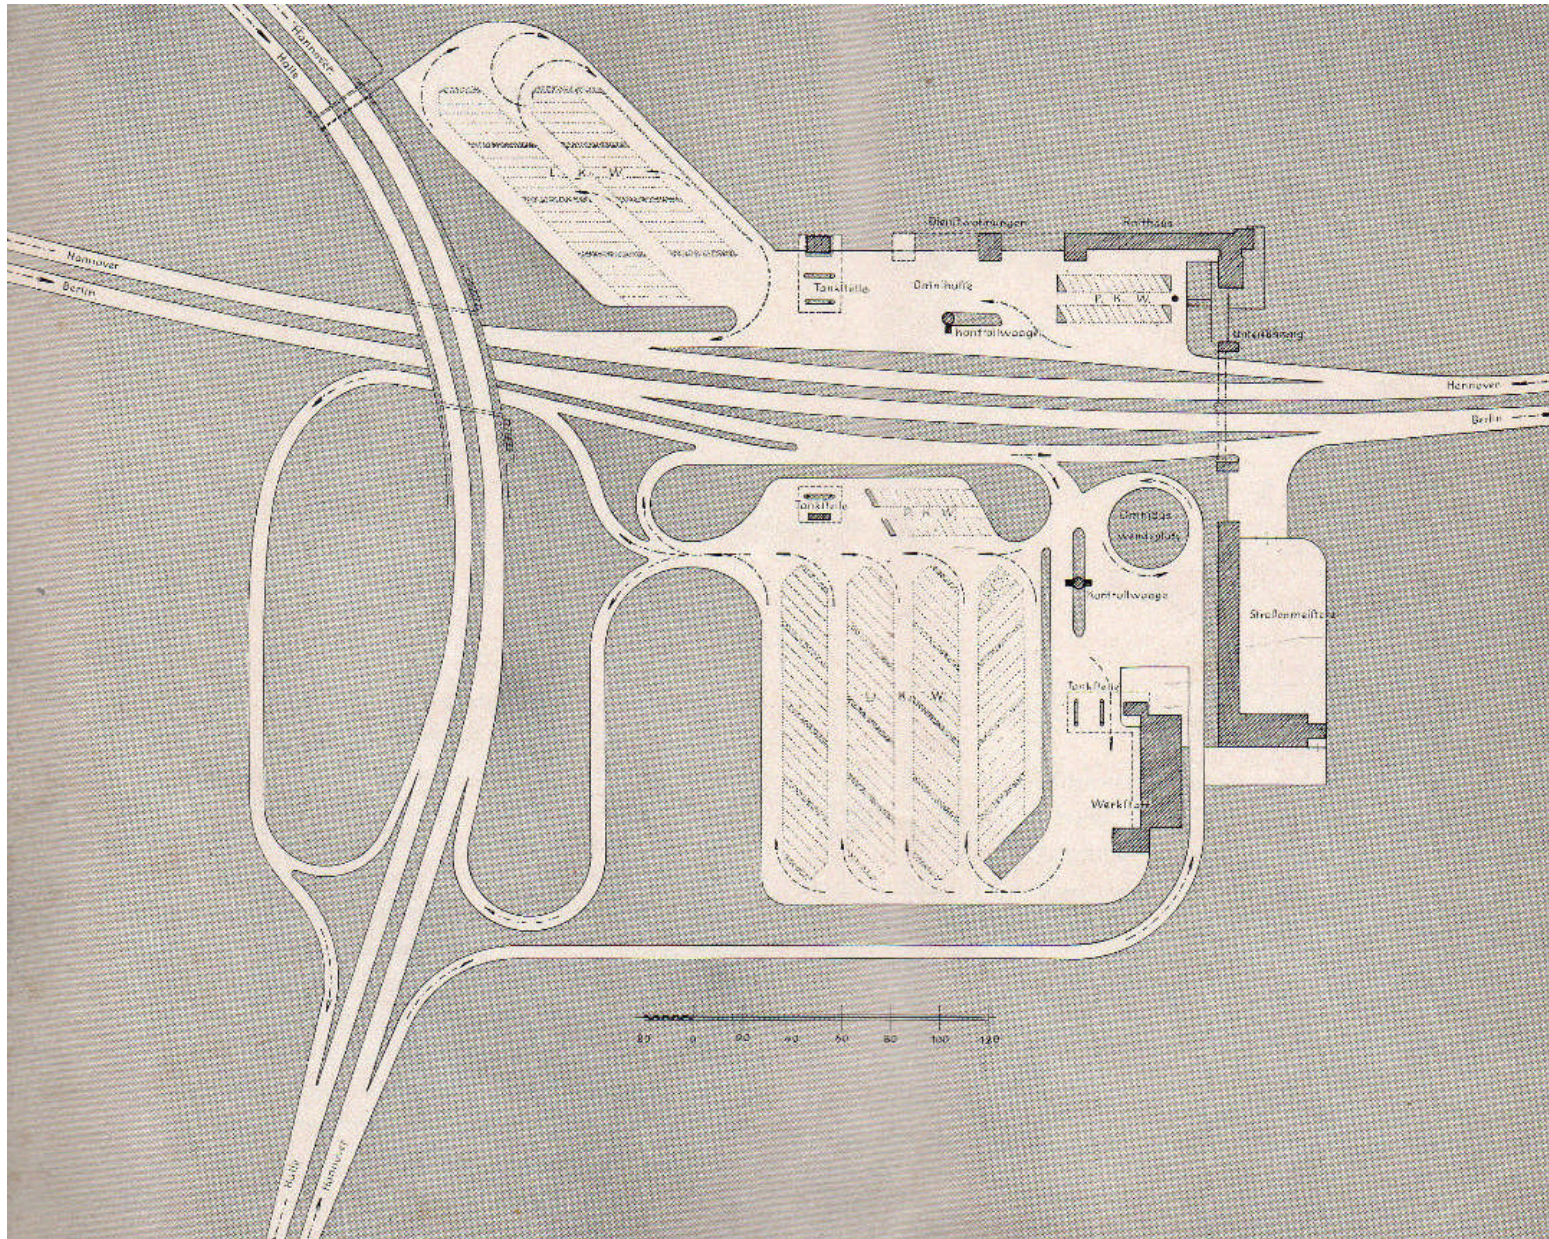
Service station of autobahn line near Olvenstedt. Rest-house, filling station, repairing shop, control office, maintenance post (surfaced area and roadway are white)
